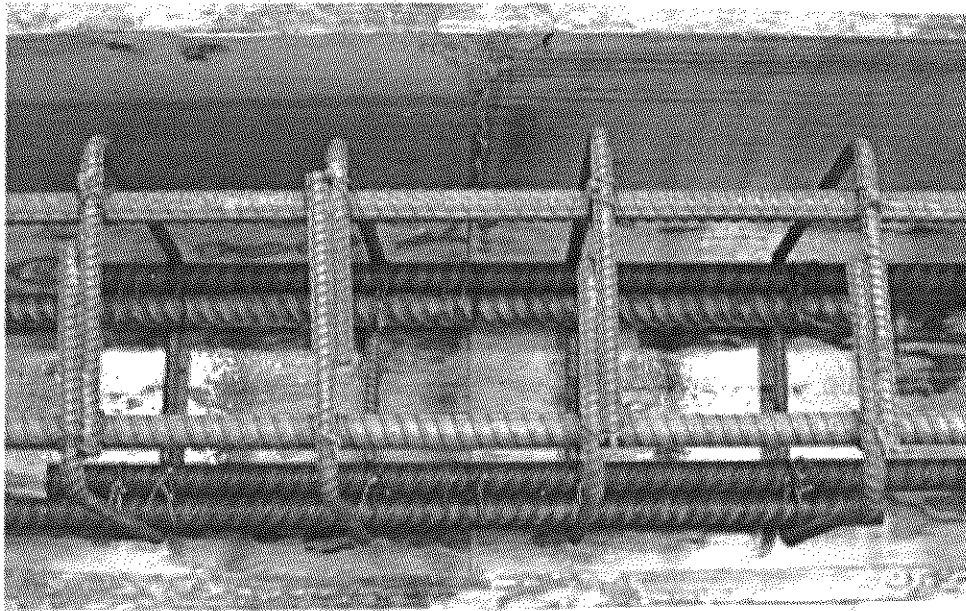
Typical beam splice test specimen with 3 splices and stirrups
